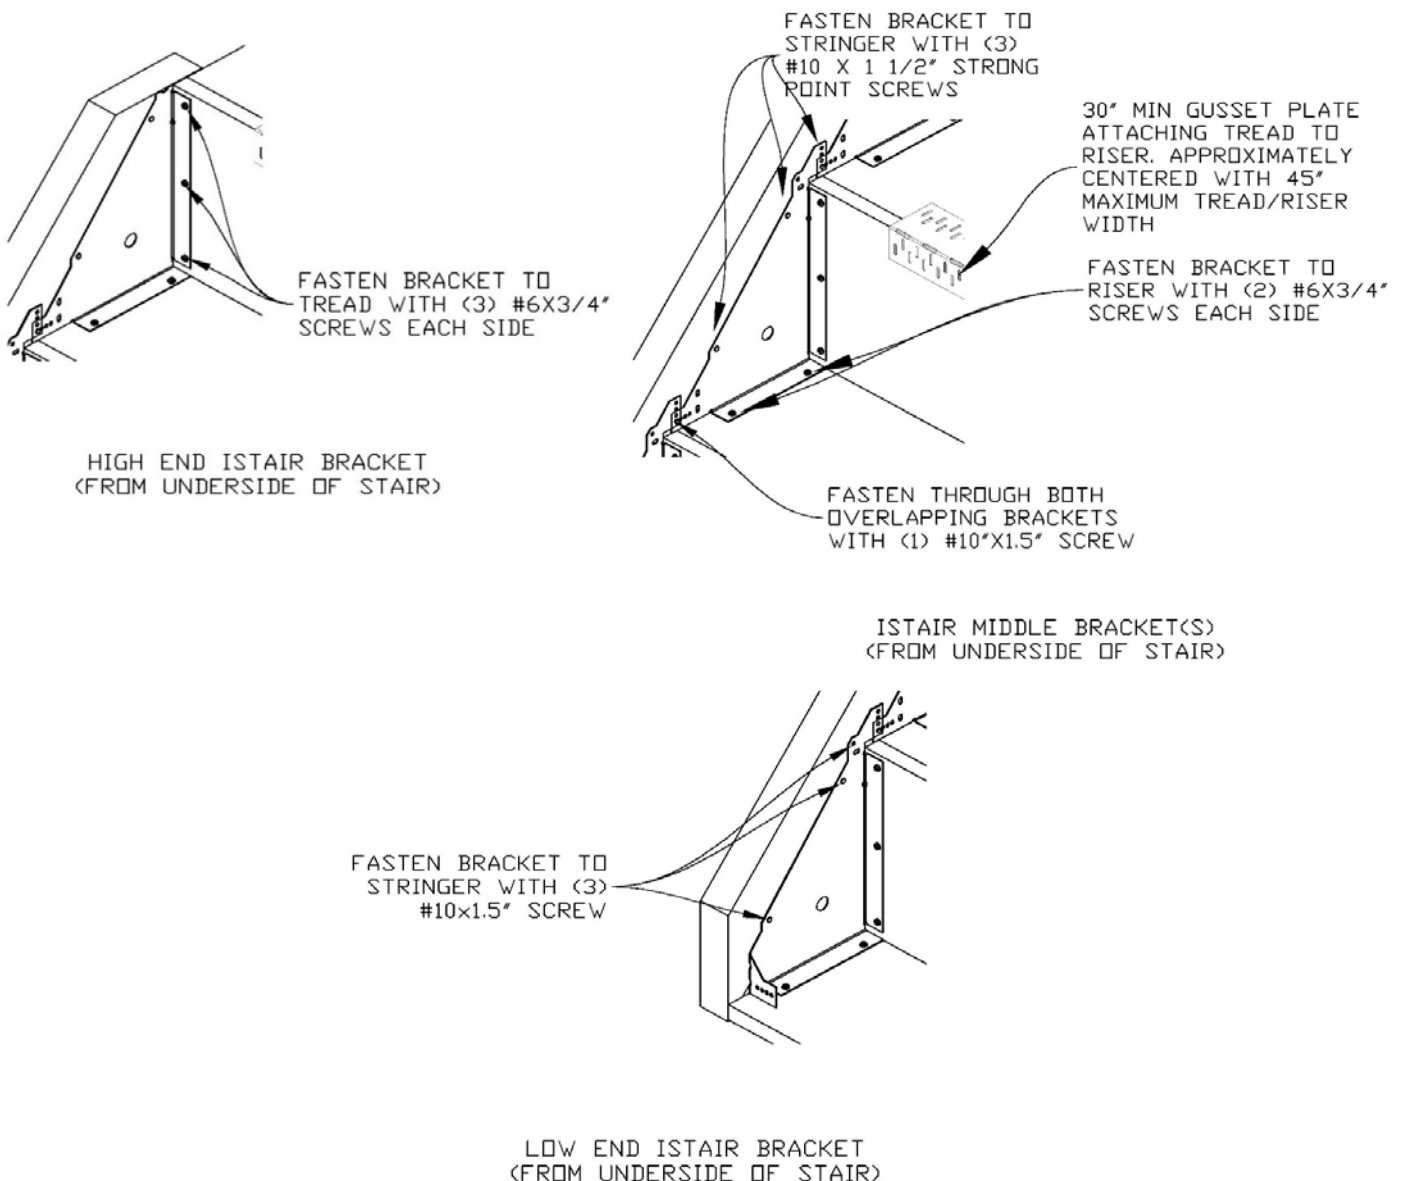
ISTAIR™ Bracket and Gusset Installation Details
